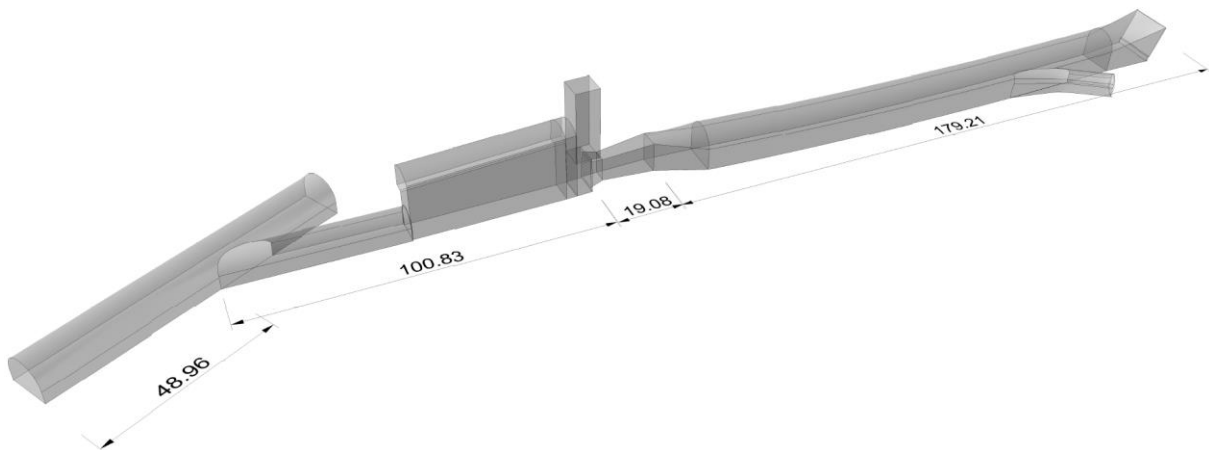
Geometry of the investigated zone of the sand trap with prototype dimensions [m]
